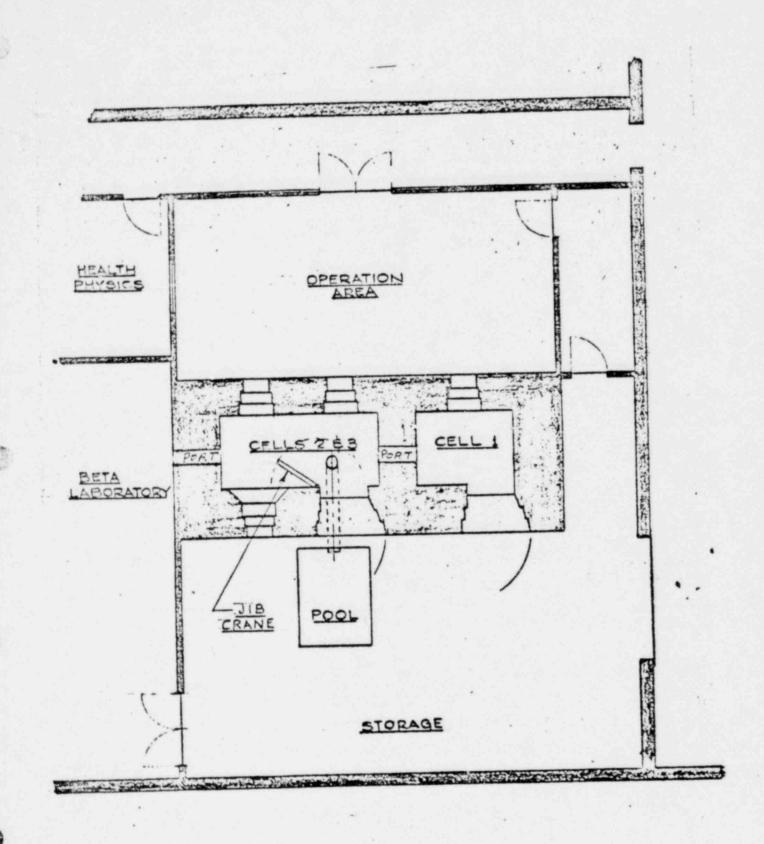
FIGURE ! MAIN FLOOR PLAN HOT CELL COMPLEX
